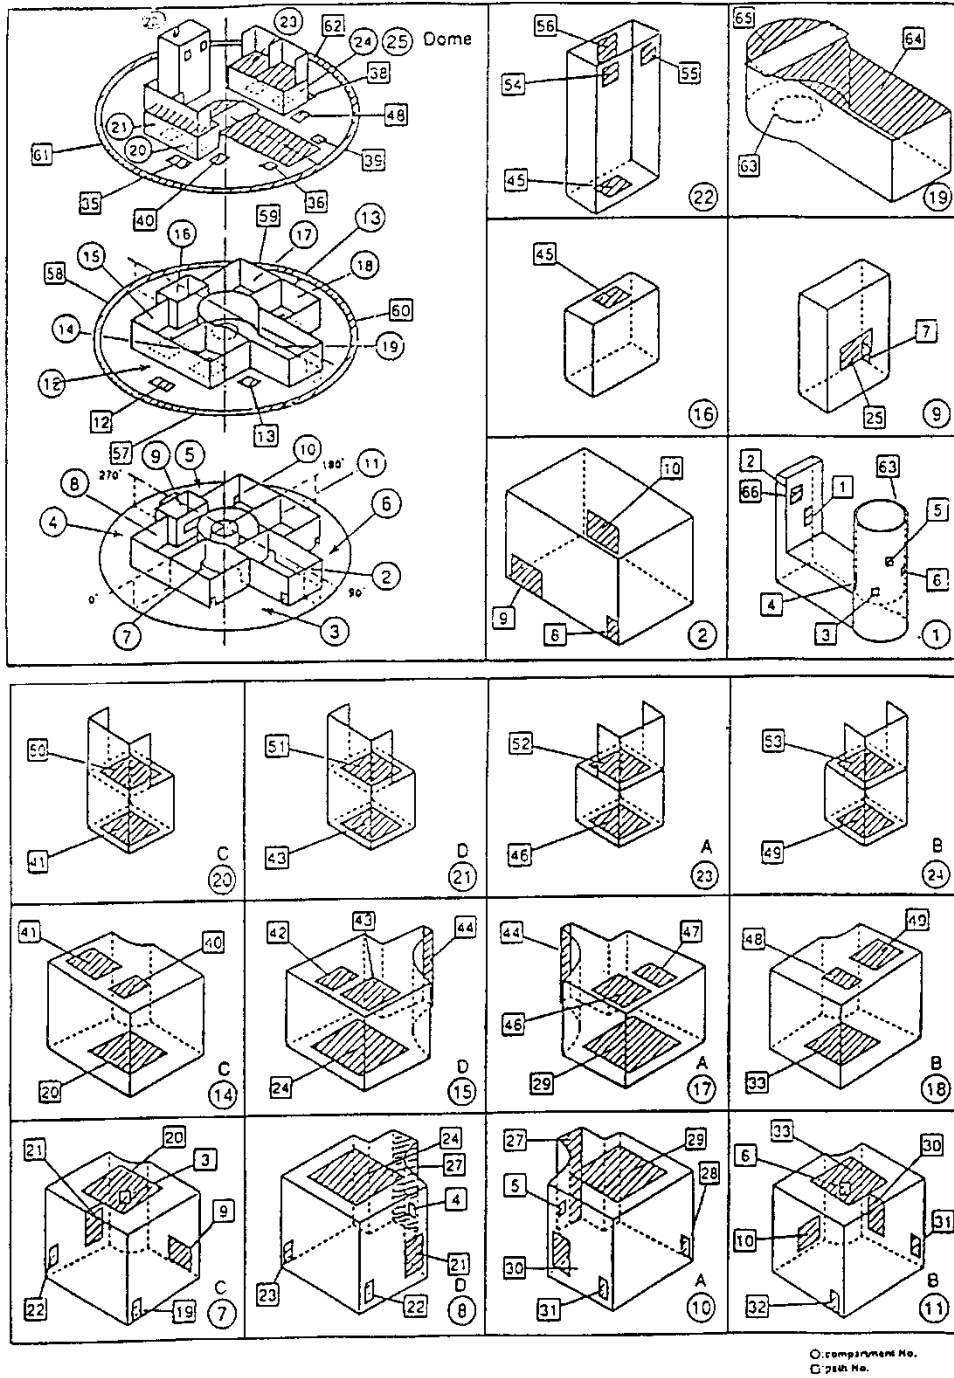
Detailed NUPEC Facility Layout [3.15.1]
